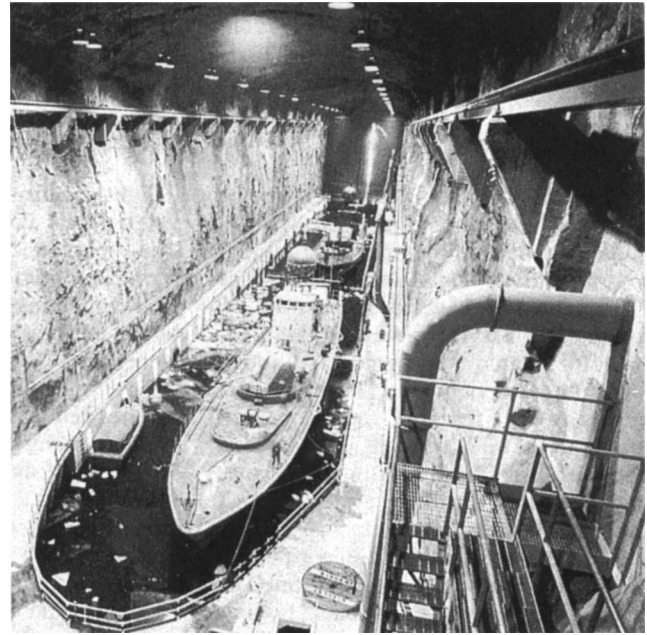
Royal Swedish Navy facility at Musko in Sweden (permission: Tunnels & Tunnelling, London).
